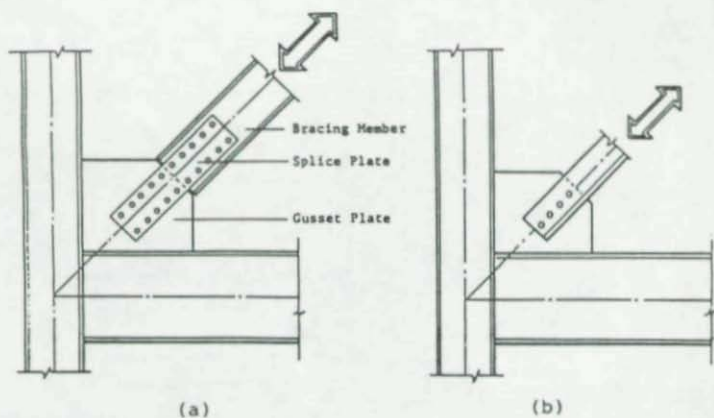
Typical Gusset Plate connections of a Diagonal Bracing Member
